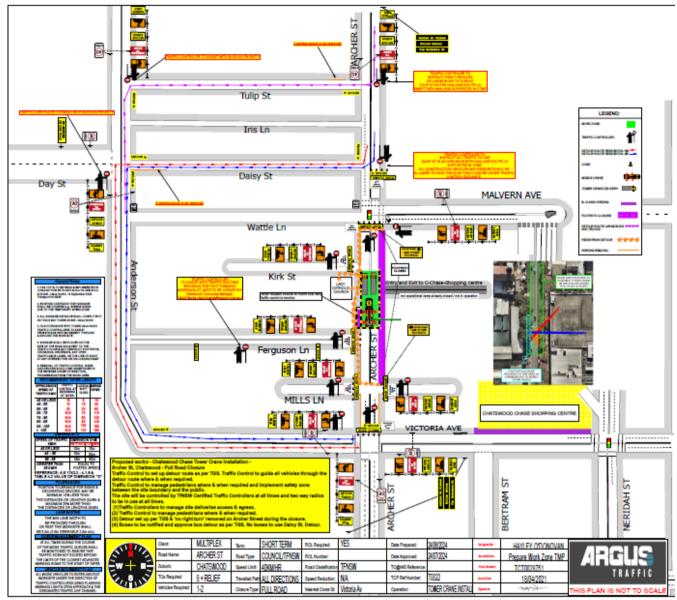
(full image in appendix) - Showing safe ingress and egress in and out of site Entering and Exiting using Archer St Road Closure.
